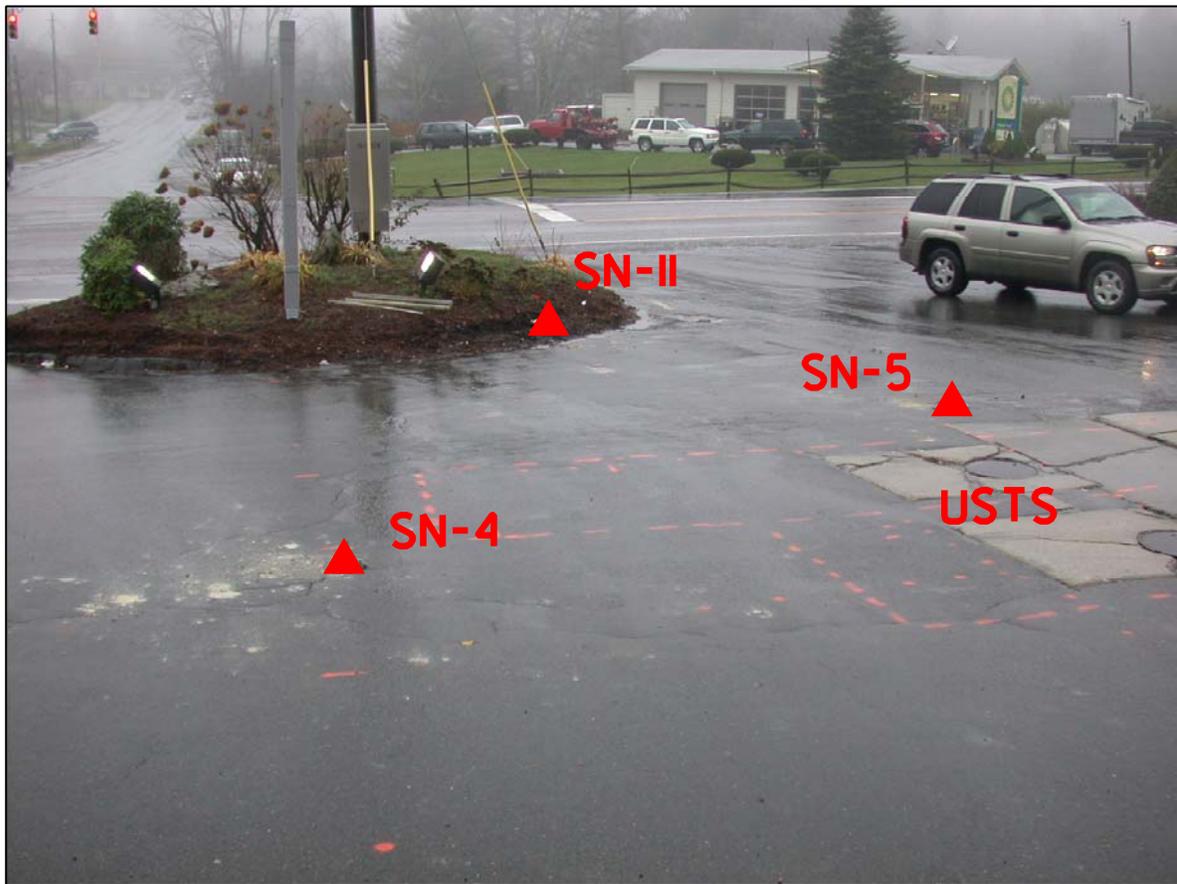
BORINGS AT USTS LOOKING WEST
